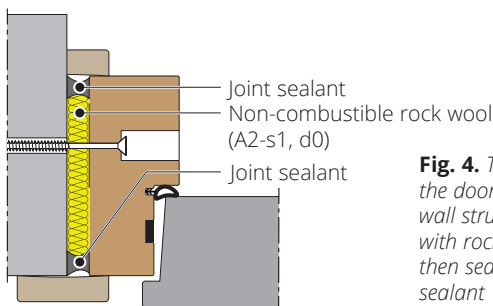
The gap between the door frame and the wall structure is filled with rock wool and then sealed with a joint sealant
